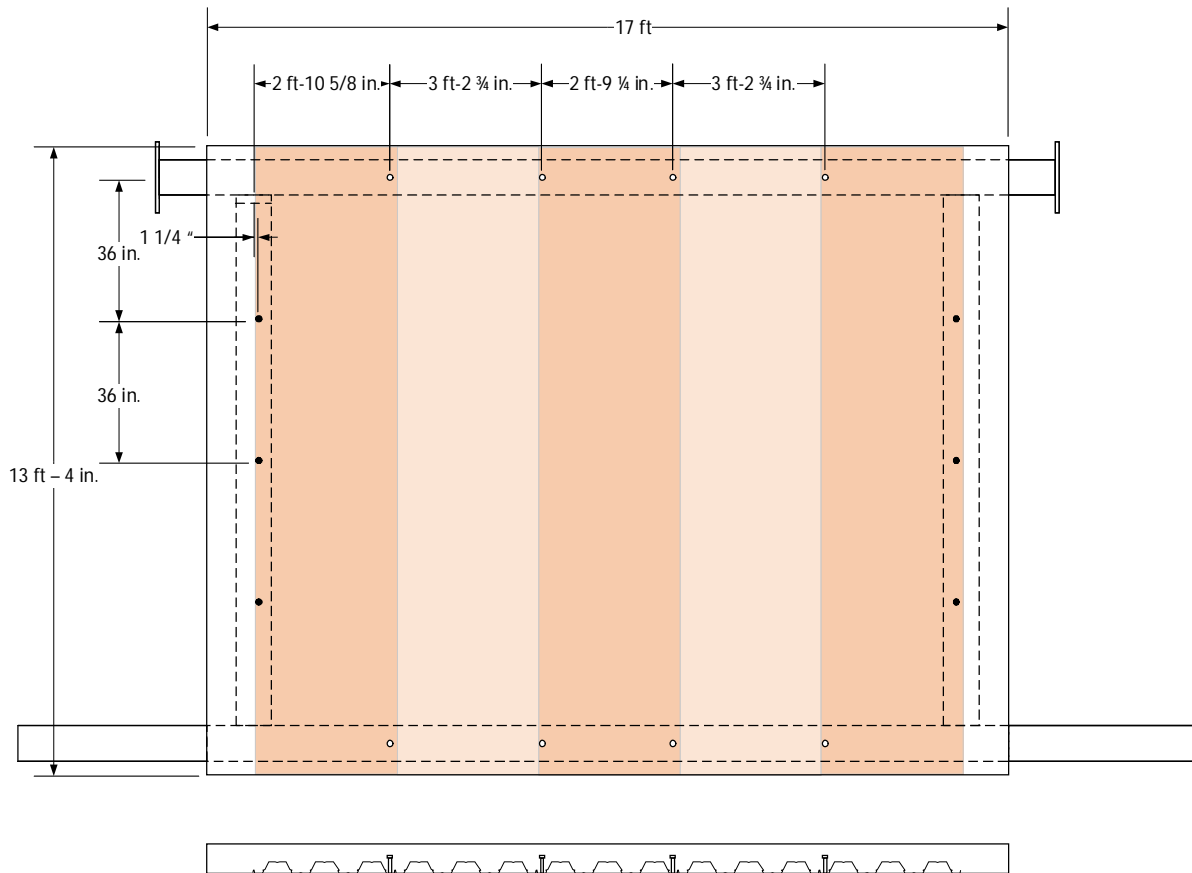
Headed Stud Placement in Specimens Designed to Fail Perimeter Fasteners
